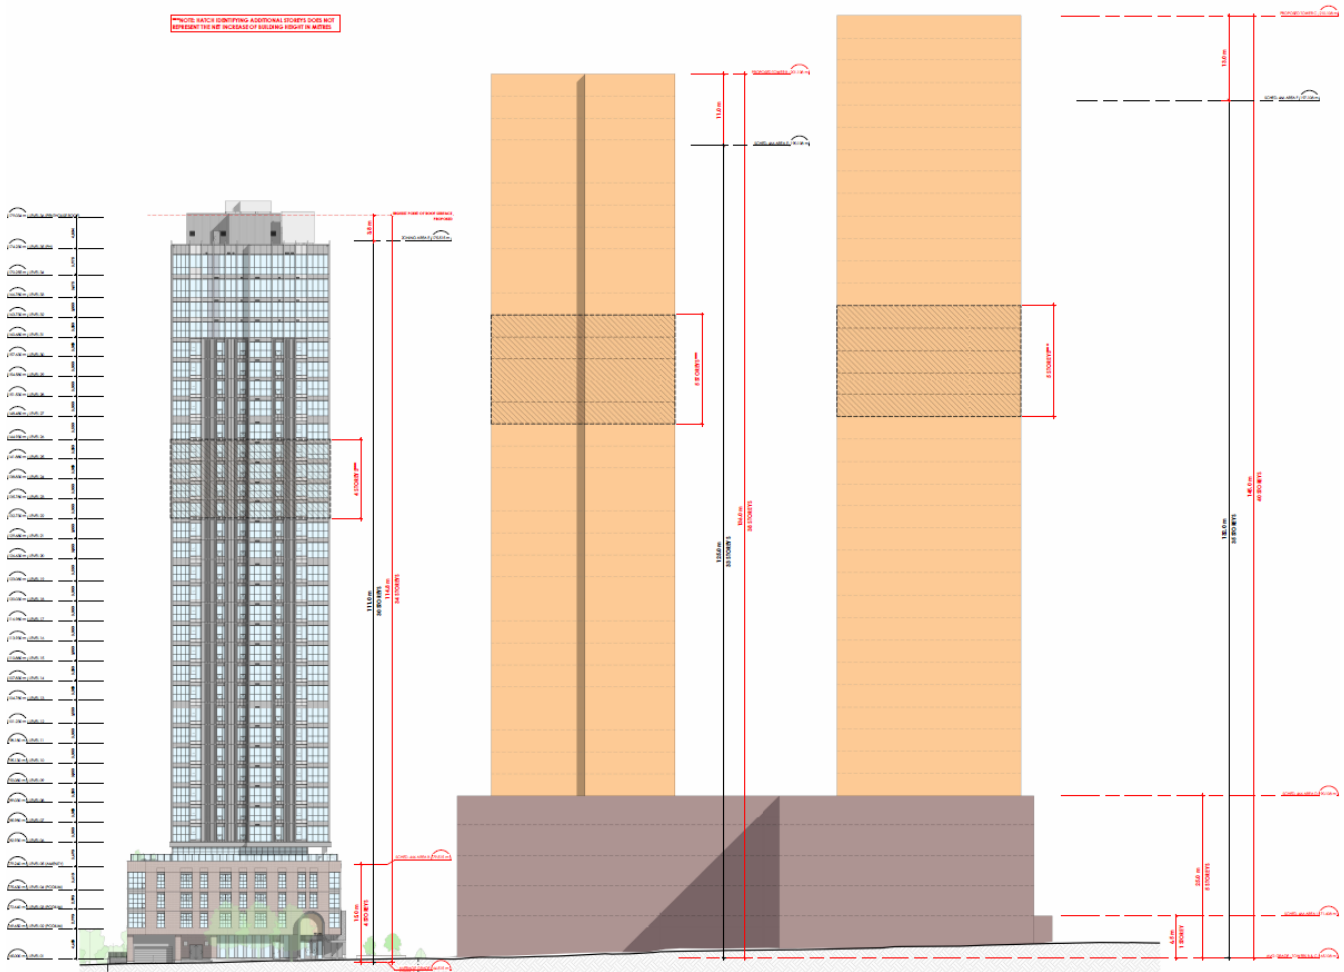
Building Cross-Section with hatching indicating newly proposed floors.
